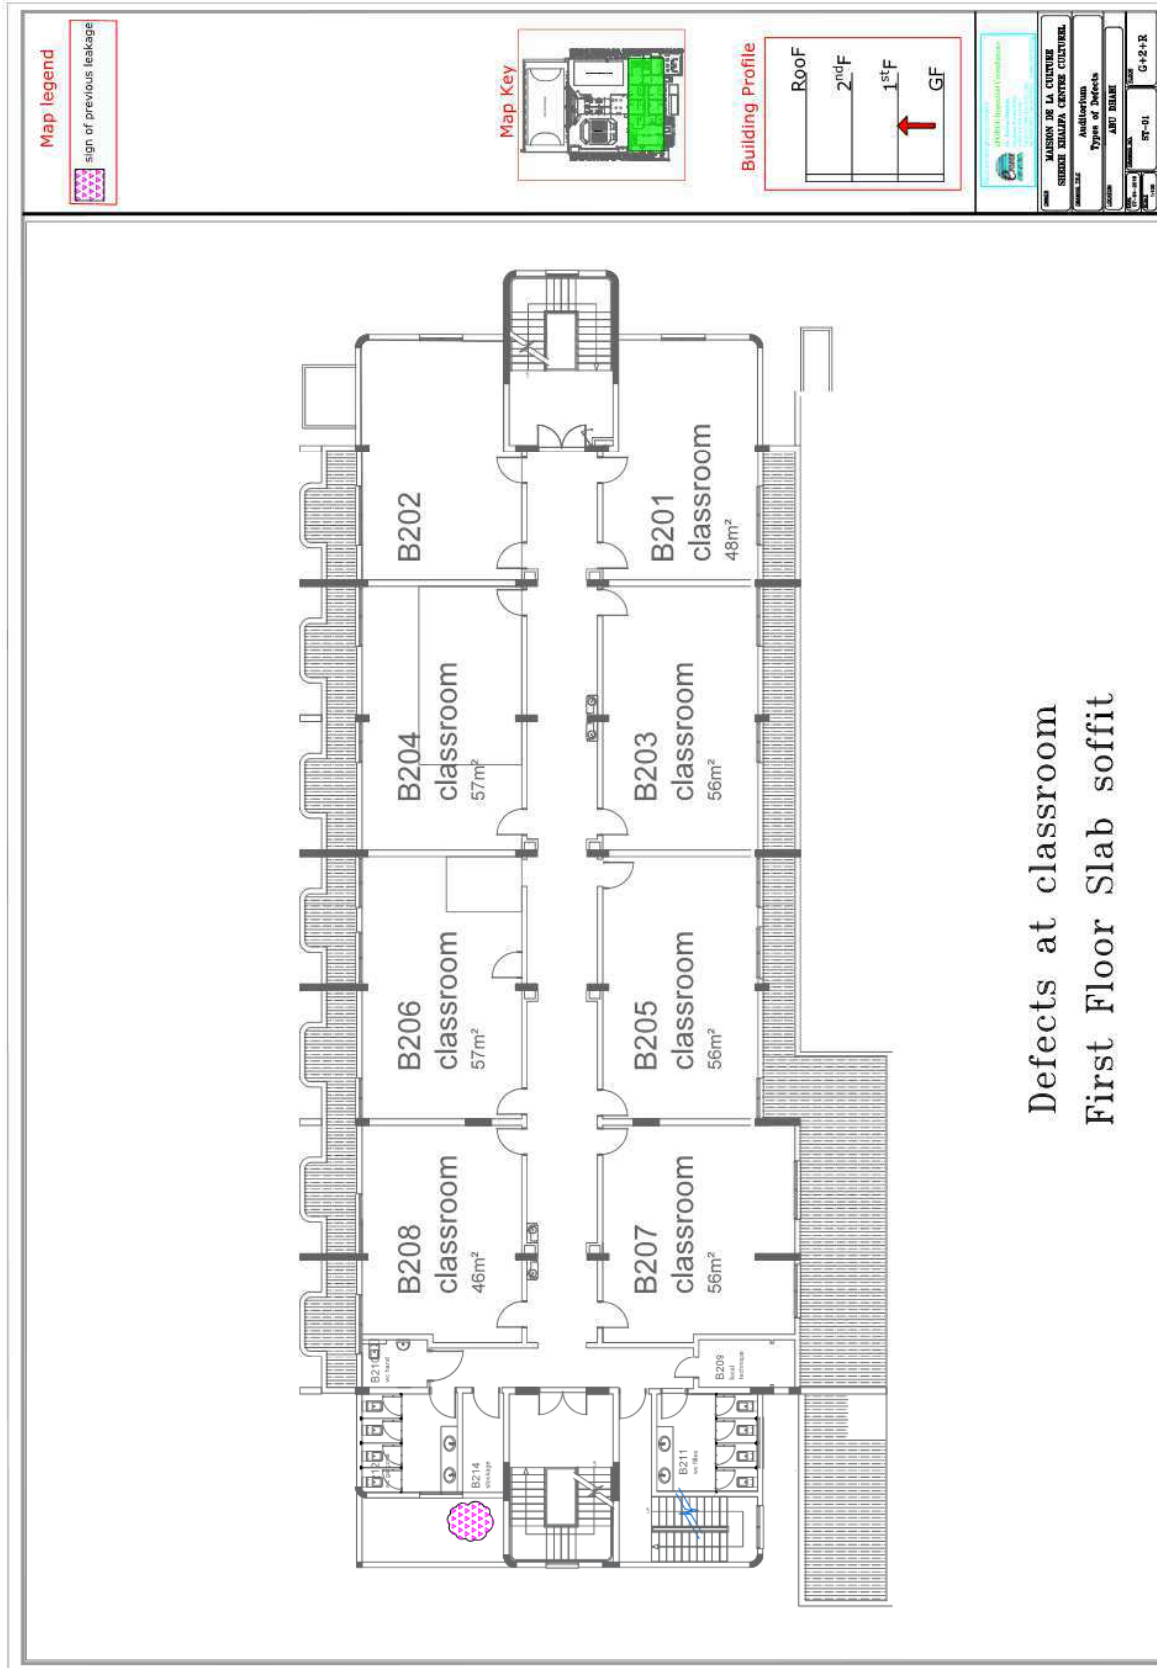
defects in Classroom building in first floor slab soffit
